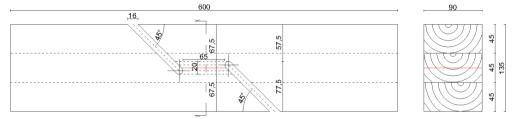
Example of shear specimen plan view and cross-section. Red line indicates expected fracture surface location.
